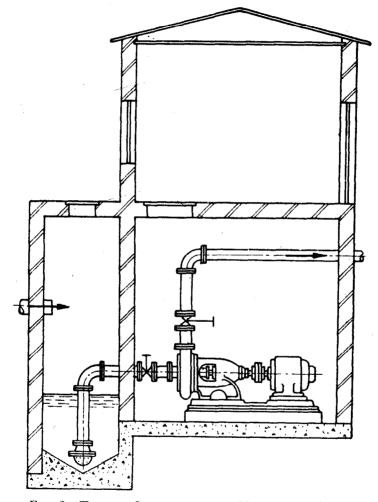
Typical Illustration of Horizontal Shaft Dry Well Type Pump
